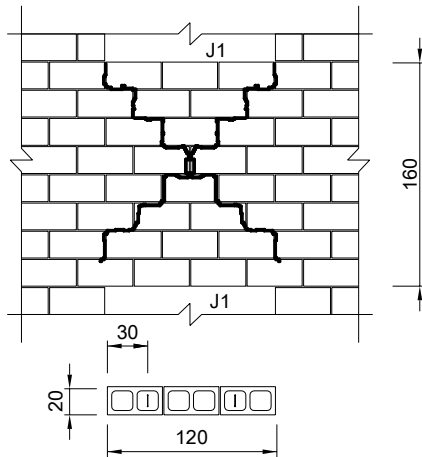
Diagonal cracking in beam L2 and reinforcement to be applied.
